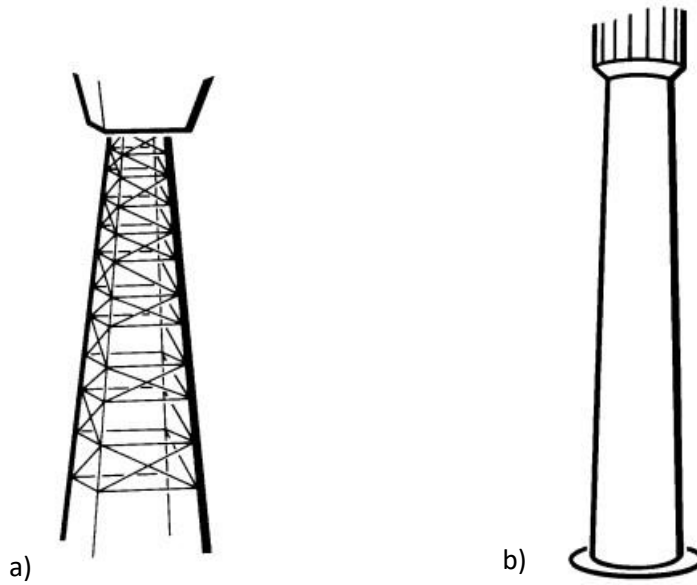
a) Freestanding Steel Tower, b) Reinforced Concrete Tower. [48]
